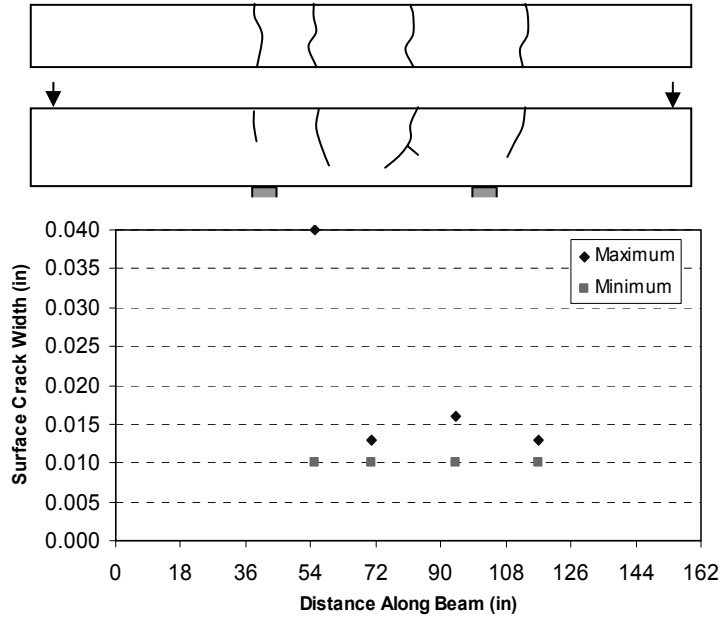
Final Crack Pattern and Measurements – Beam 2.6<sup>6,7</sup>
